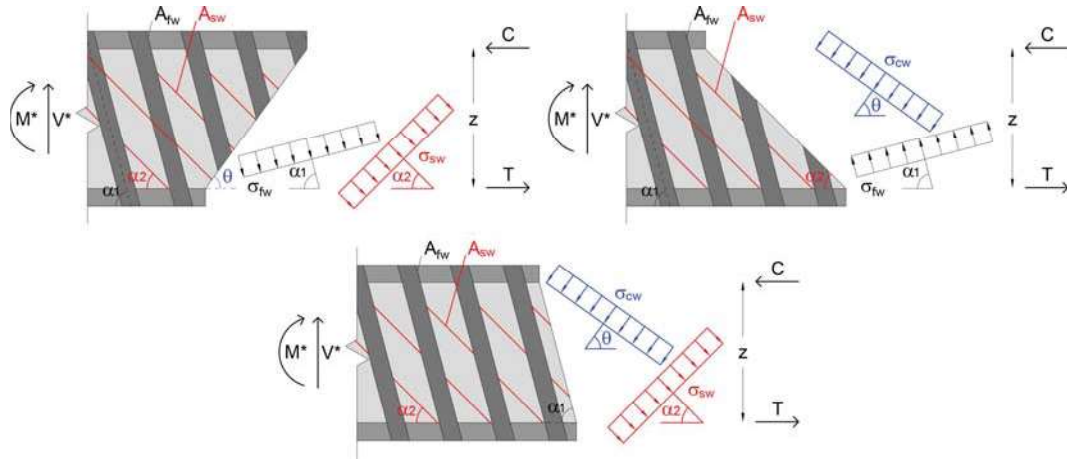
Different beam segments identified through three sections parallel to stress field direction of: concrete strut (a); steel stirrups (b); FRP reinforcement (c).
